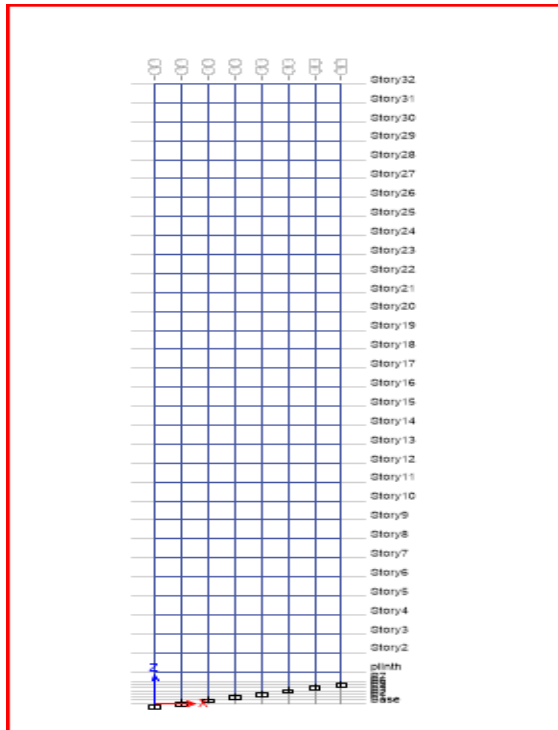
elevation view of g+30 with 5-degree slope in Etabs
